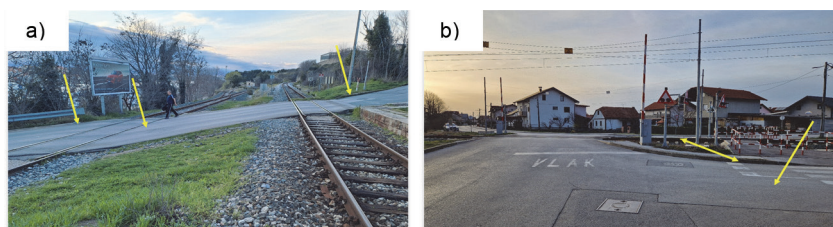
a) Crossing on M607 (L211) provided with bumpers without other measures (light and sound, pedestrian crossing fences). Very poor elements of the road level with “knife” positions, large longitudinal slope, b) Crossing on railway line R201, secured with half-bumpers, with light-sound measurement and camera, has pedestrian crossing fences. Good elements are the levelling of the road
